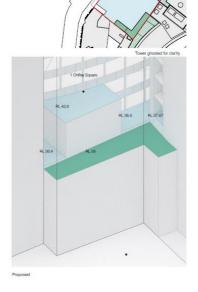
| Proposed massing to the rear – southern corner (Source: Woods Bagot)
